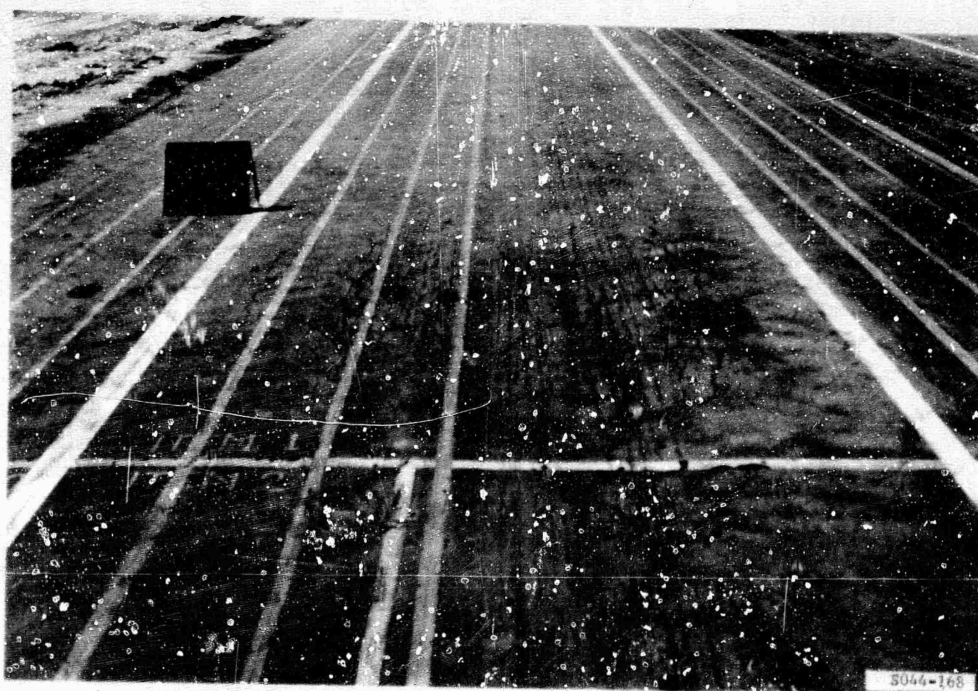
Failure of Flexible Pavement in Item 1, Lane 2, Caused by Subgrade Shear Deformation
